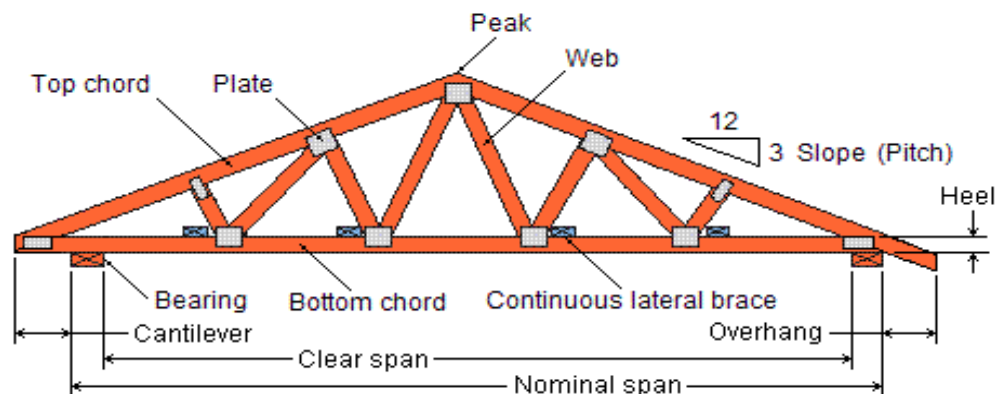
Steel truss example, details (Alpine Engineered Products, 2000).
